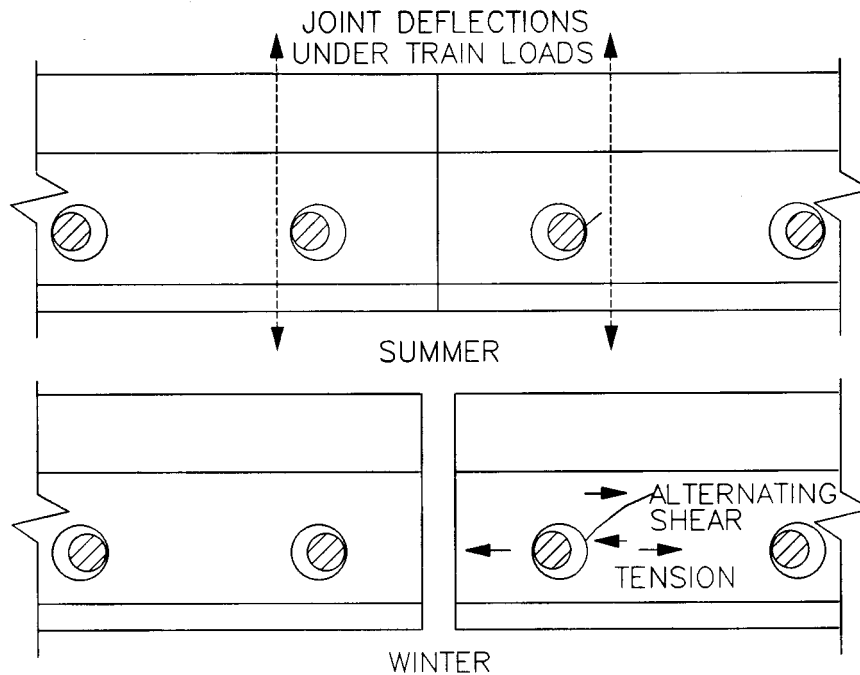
"WINTER BOLT HOLE CRACK" MECHANISM
